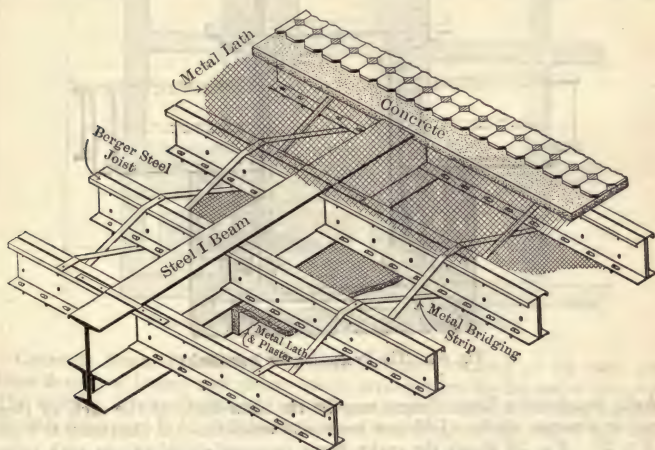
Berger's Metal Lumber and Concrete Floor-construction
